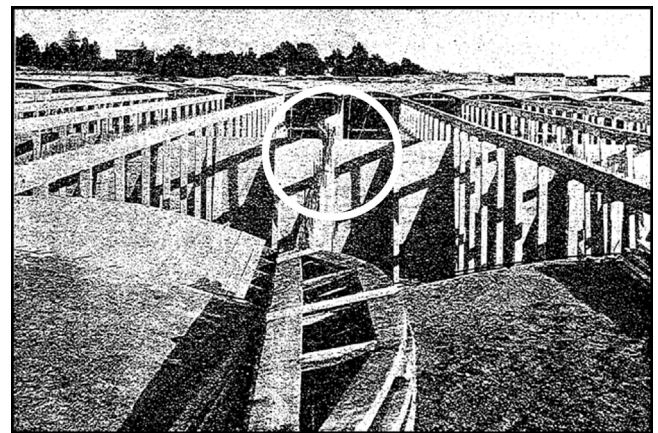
Deformations of a beam in the first chamber, June 1905. *Revista de Obras Públicas*, 14 March 1907.
